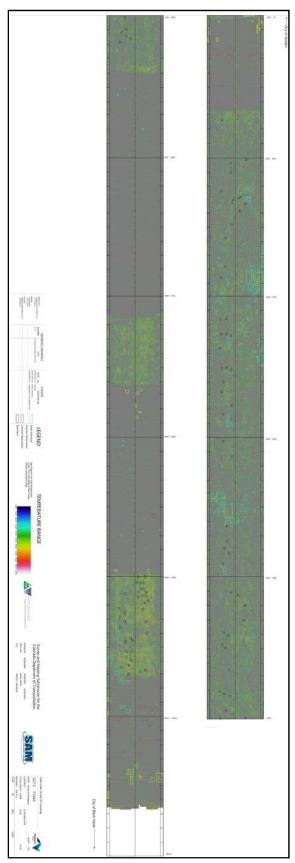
Tunnel 2 Auto Detection, Bolt Plates
